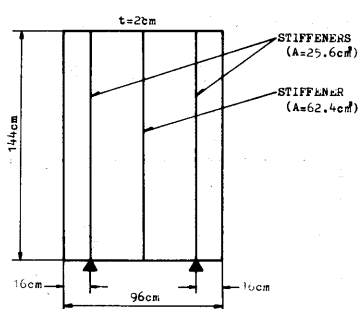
CROSS SECTIONS OF MODEL GIRDERS
